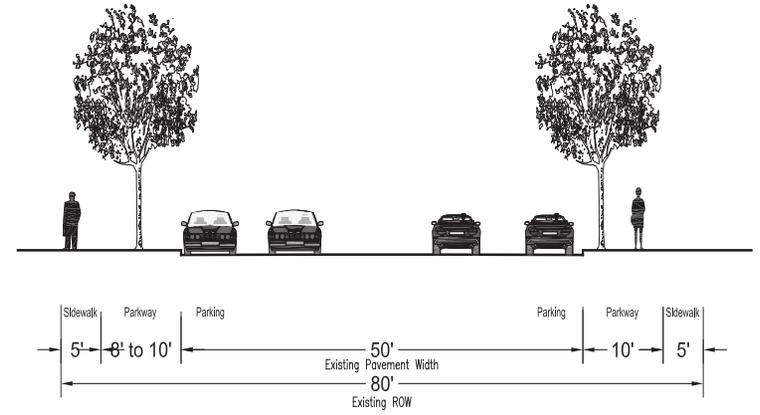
TYPICAL SECTION - 2ND STREET
